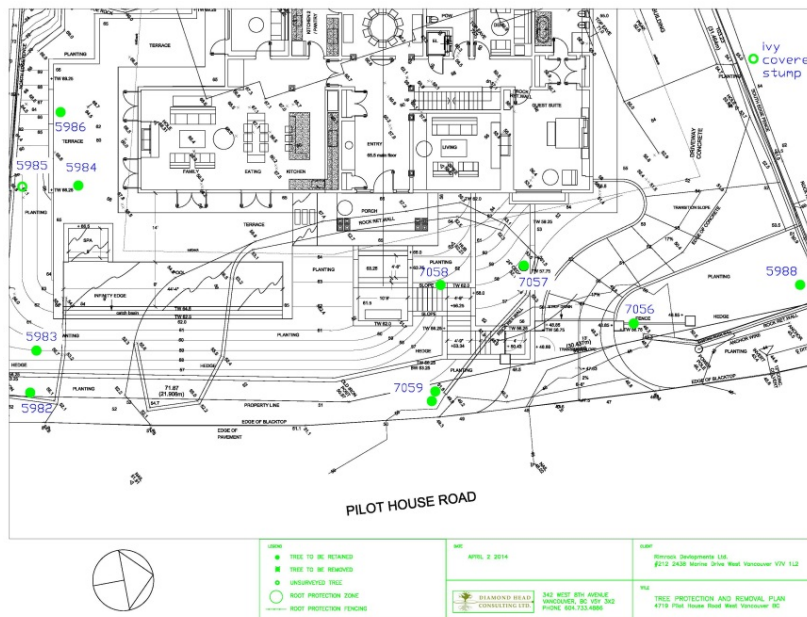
Location of the subject tree #7059 located on District property adjacent 4719 Pilot House Road West Vancouver
